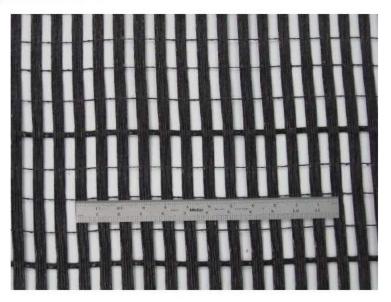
Photo of Miragrid 24XT (machine direction is perpendicular to ruler shown).
